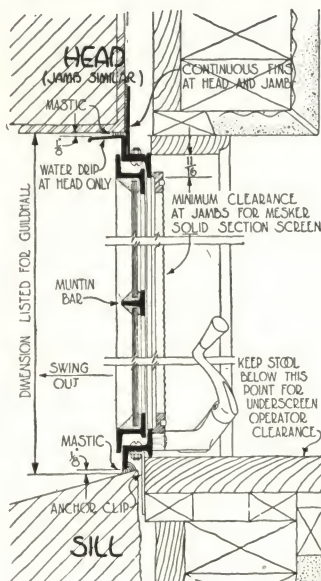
DETAILS SHOWING INSTALLATION—ASSEMBLY OF
